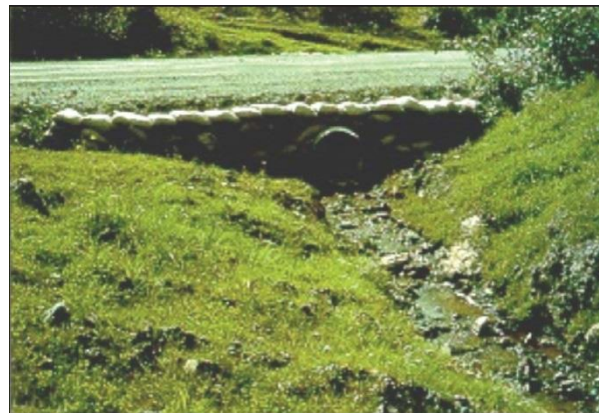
Cross Drainage Culverts and Take-off Ditches Carry Water from the Road and into Surrounding Vegetation (Gosse et al. 1998; (DFO, 2022)
